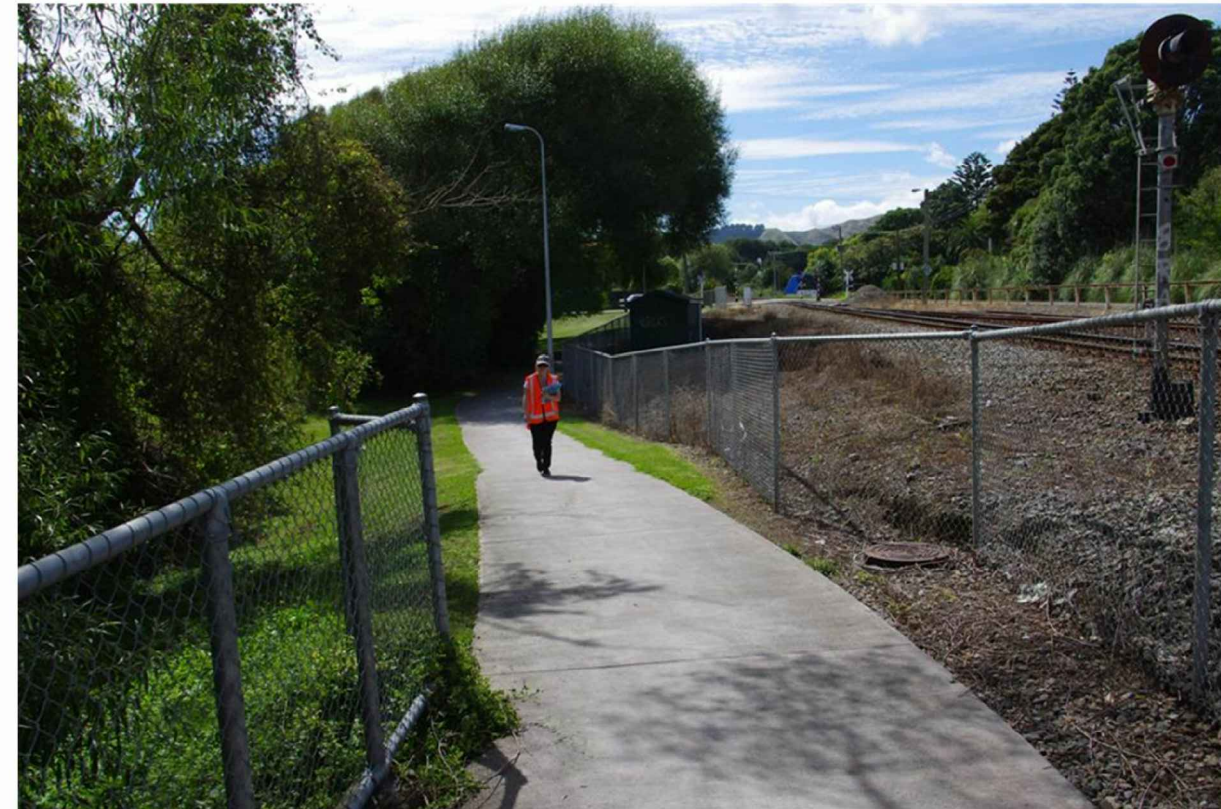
Rahui Rd to Waerenga Rd – Rahui Rd to Ōtaki Railway Station walkway
